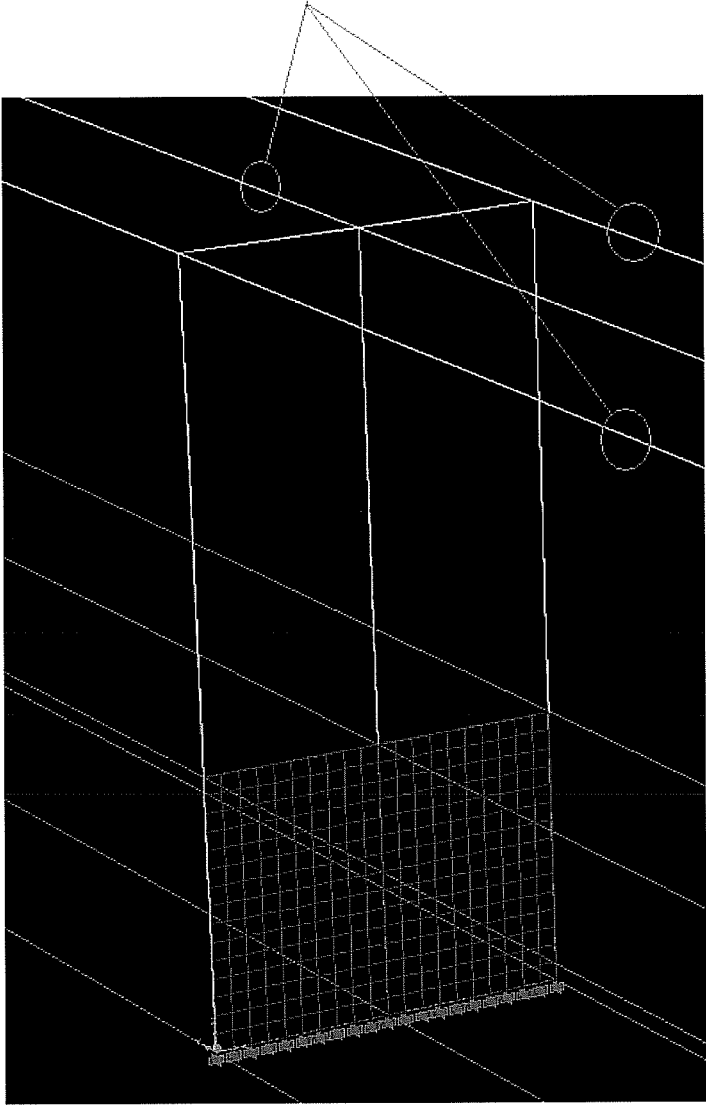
Bridge Pier Top Boundary Condition — Superstructure
